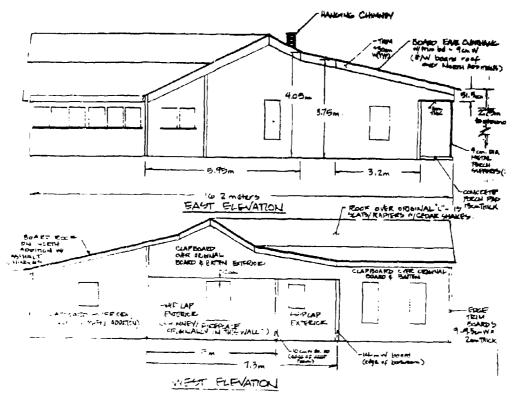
Field architectural drawings of the dwelling at 41CO121. (a) east elevation, (b) west elevation. Note: window and door details are not shown; these are on file at IAS, UNT.
